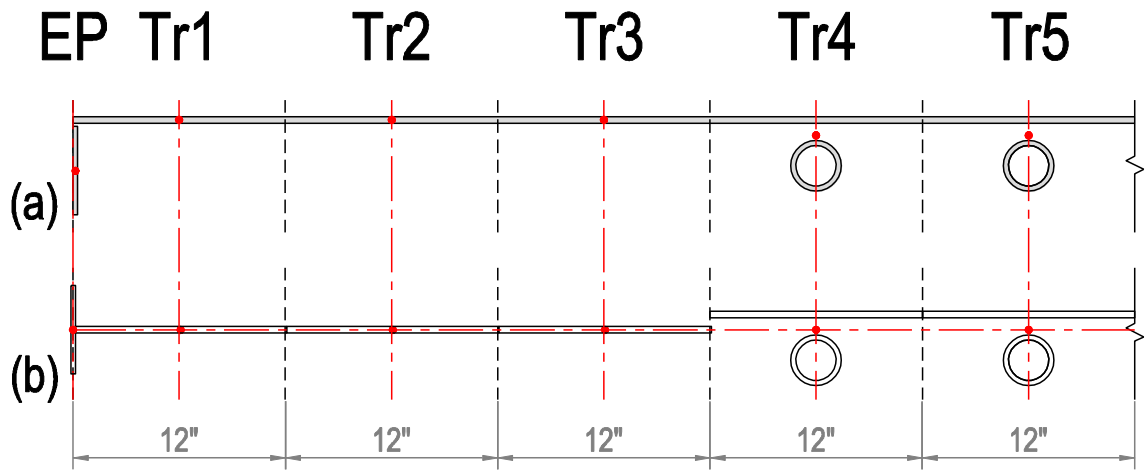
Division of bridge deck into transverse members (a) Transverse members without cover plate (b) Placement of sections in grillage layout
